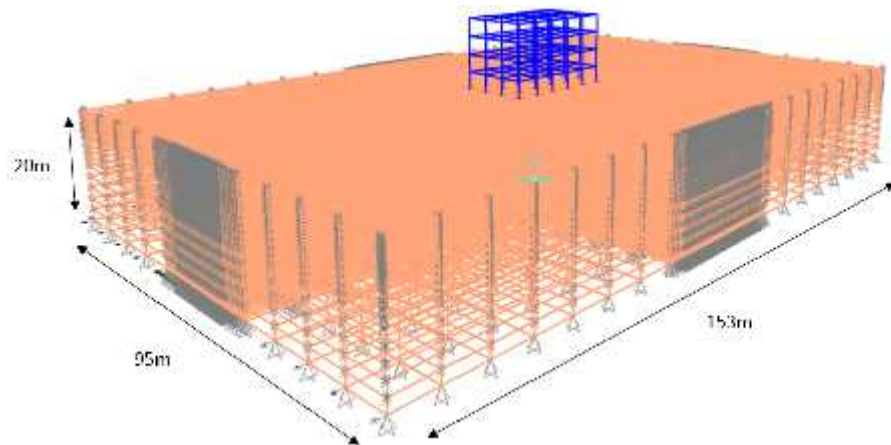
3D view of Space frame resting on unreinforced soil.
